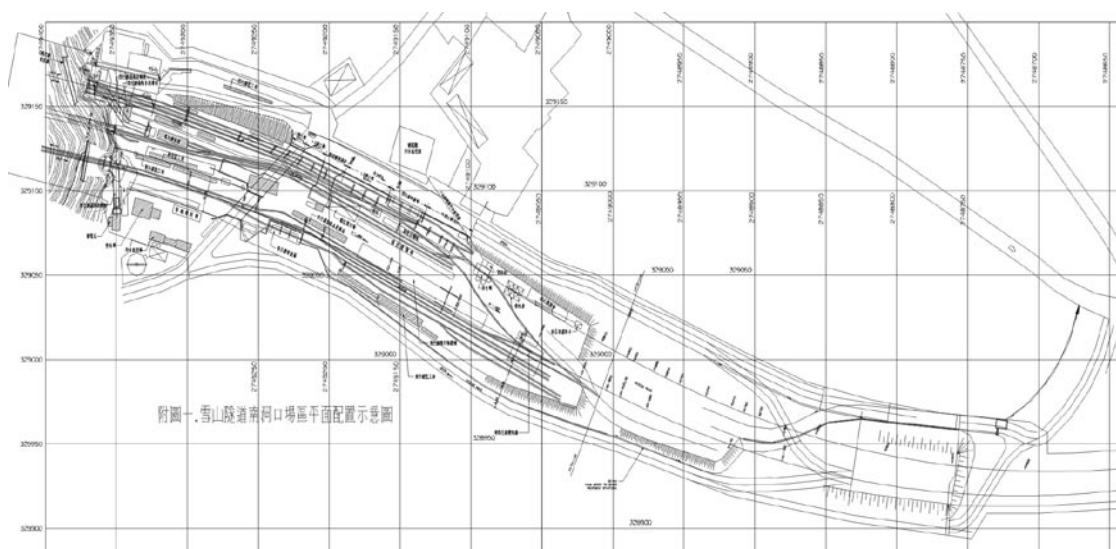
Layout of eastern portal for Hsuehshan Tunnel excavation.
